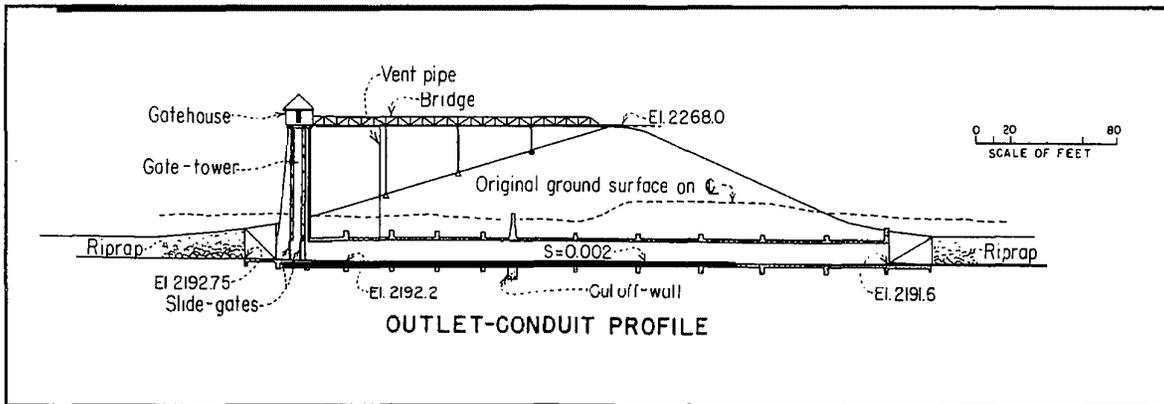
Profile of outlet-conduit, Kachess Dam and Lake prior to 1996–97 replacement of gate tower.
